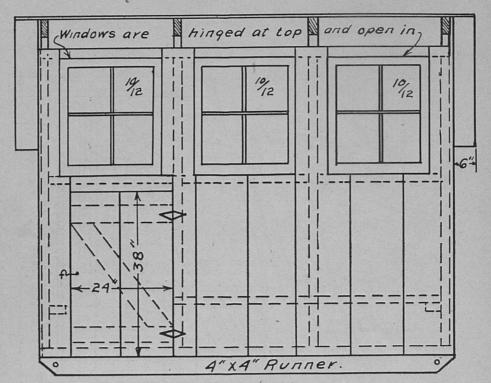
Shed Roof House C 6-39-1, front elevation.
